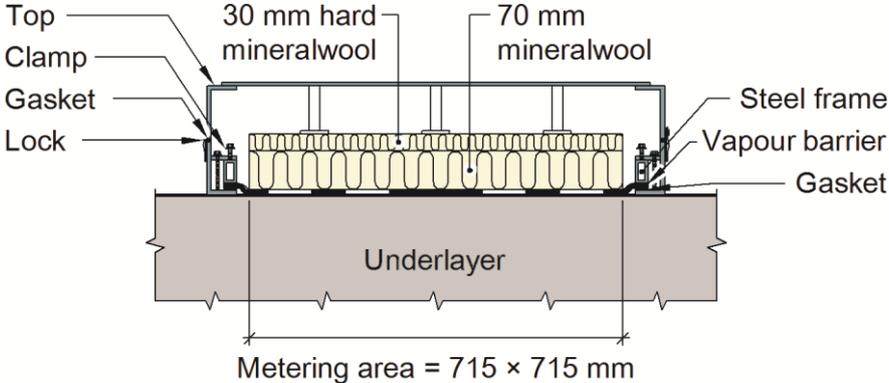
The measurement device for testing air leakage of vapour barrier joints.
